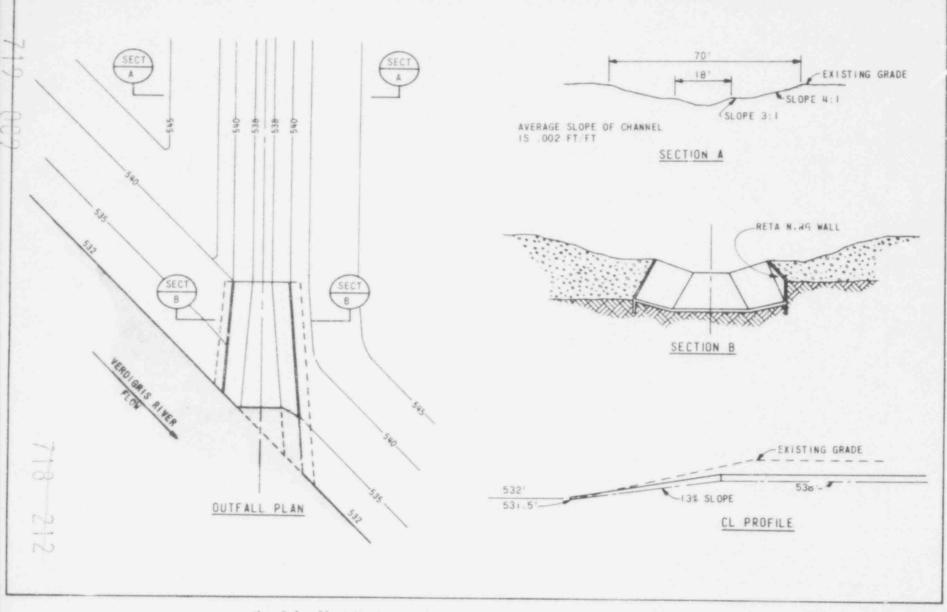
Plant Wastewater River Outfall Structure. From ER, Fig. 3.4-6.
